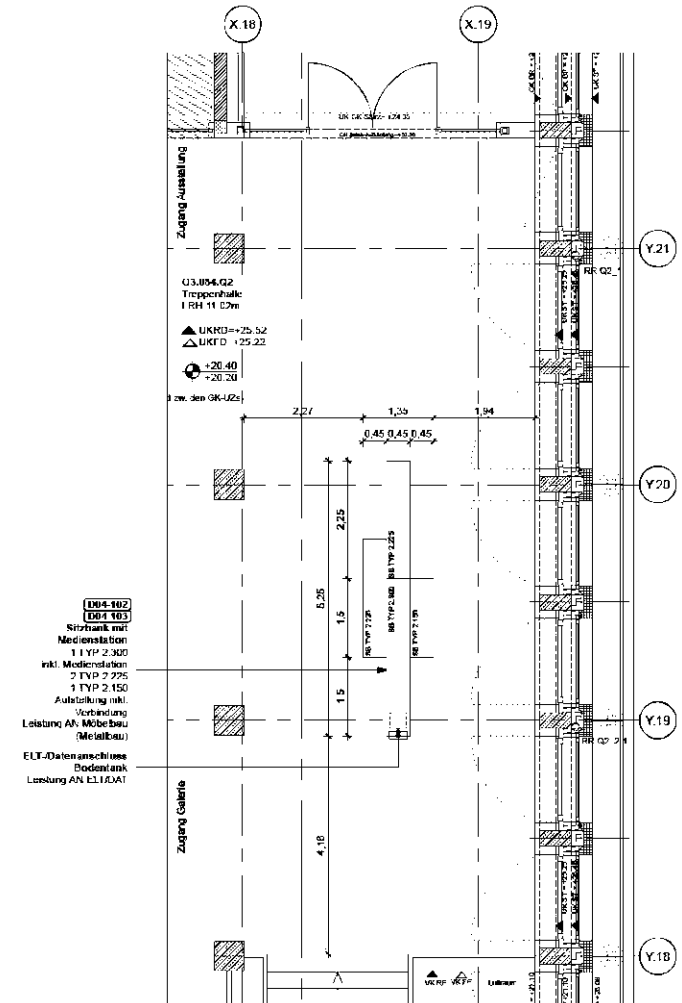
Floorplan excerpt 3rd floor, arrangement of the benches, Source: HKA
